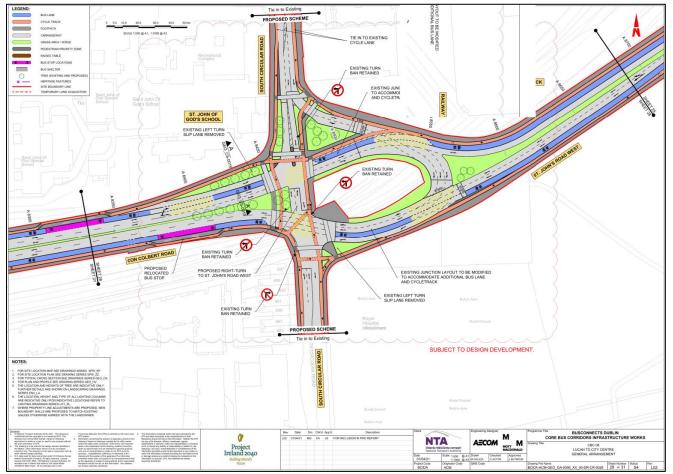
Bus Connects' Lucan Scheme Proposal at South Circular Road
